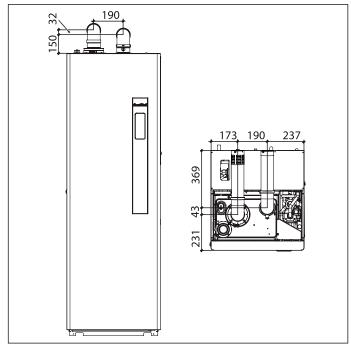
Coaxial ducts C43 - C53 - C83 dimensions
